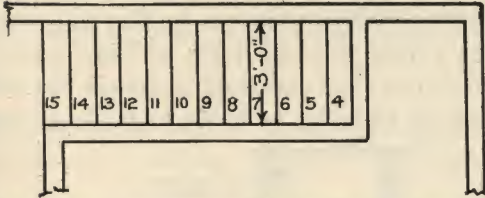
Plan of stairs on second floor—no provision for handrail.
